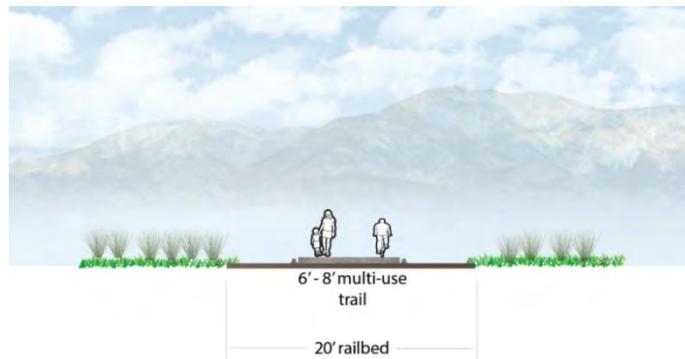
Off-Highway Trail (County Road) Concept Typical Section
